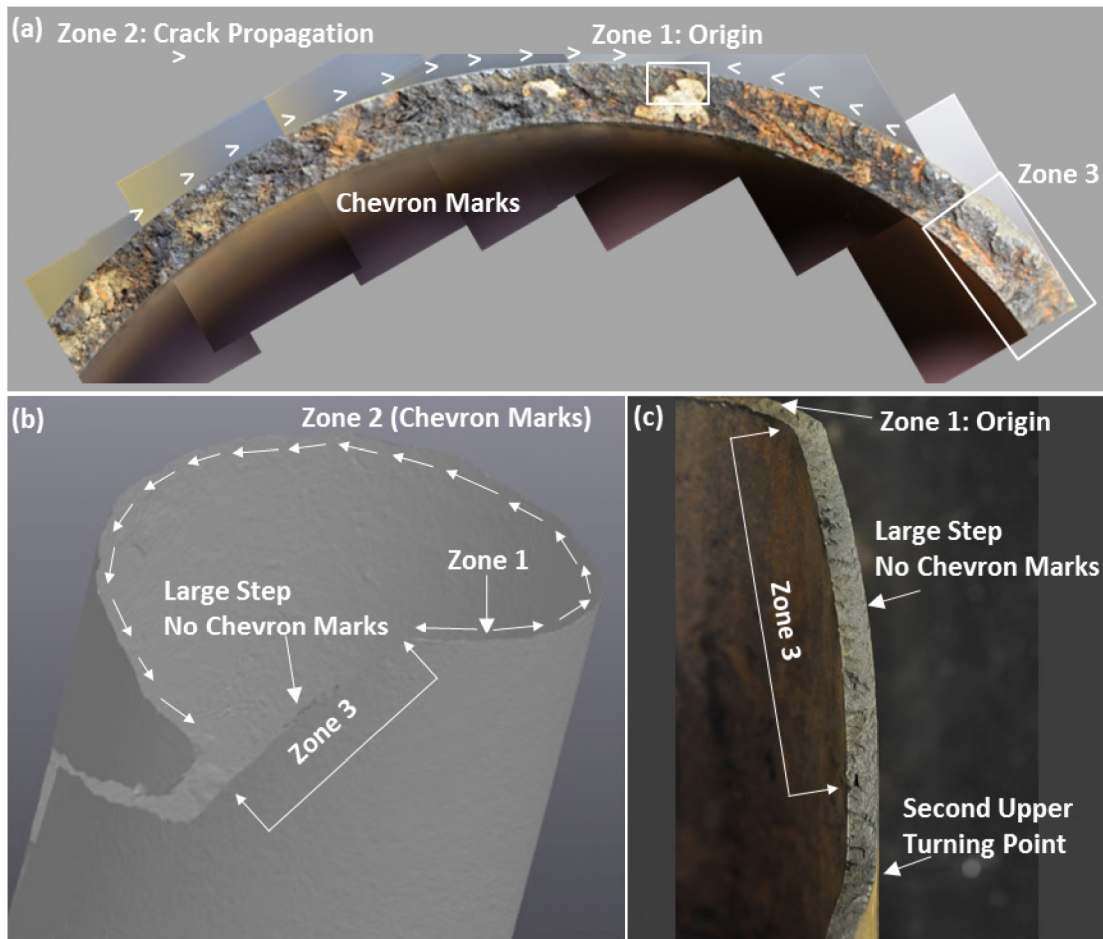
(a) Circumferential Parting and (b) Upper and (c) Lower Fracture Surfaces
